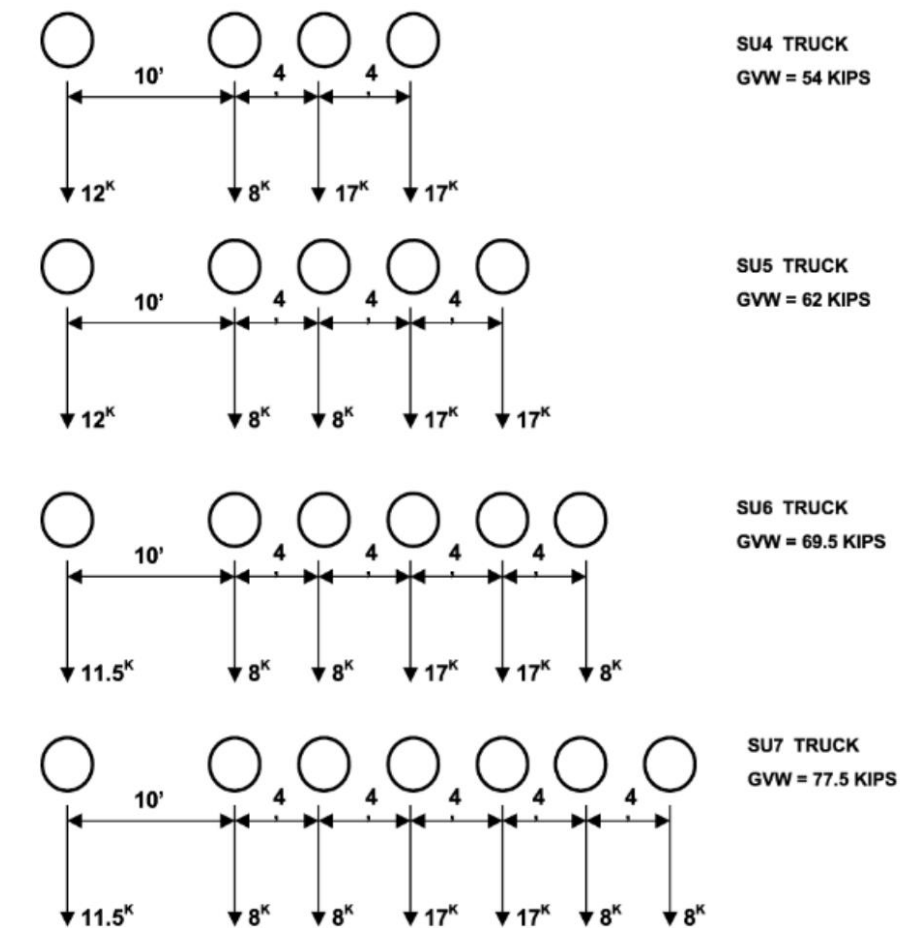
B.7.2-2—Bridge Posting Loads for Single Unit Trucks that Meet Formula B
